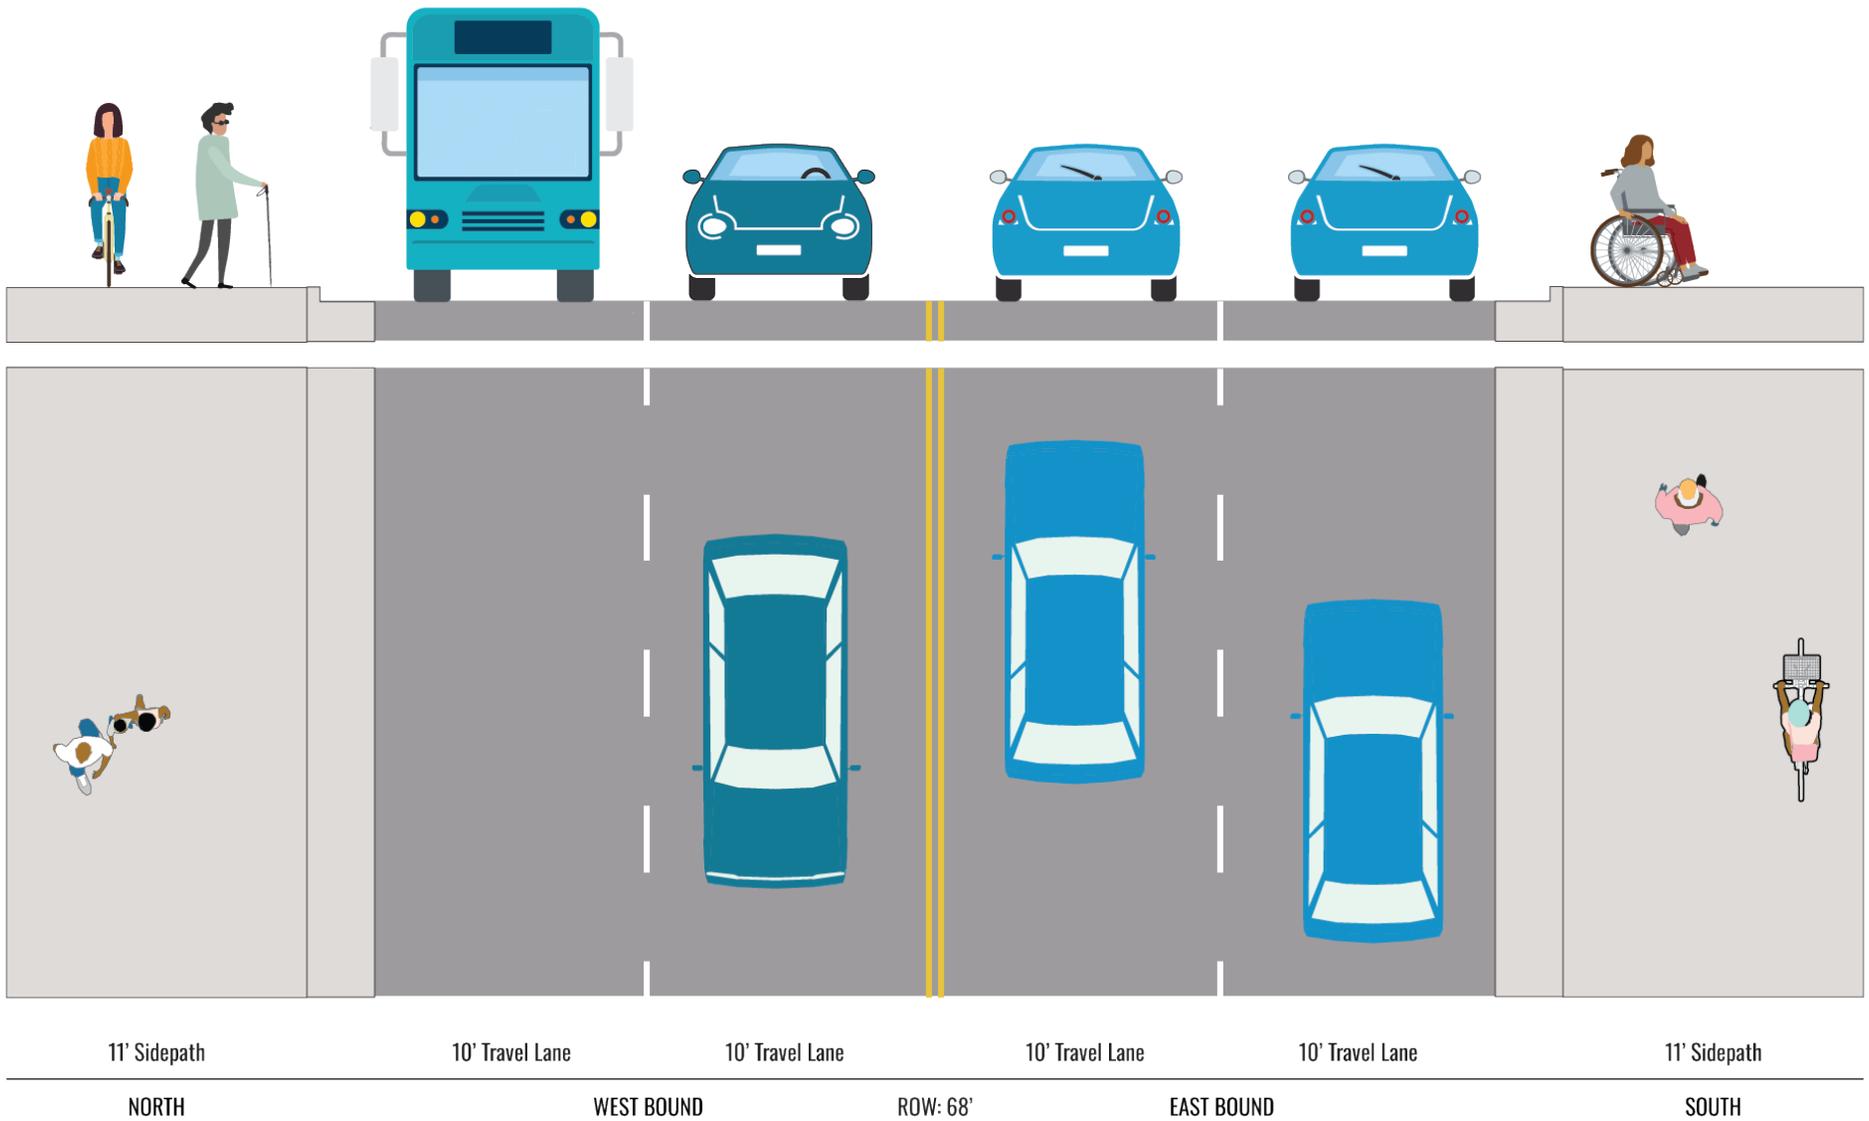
Segment A recommended alternative — Roundabouts to 4th Avenue
